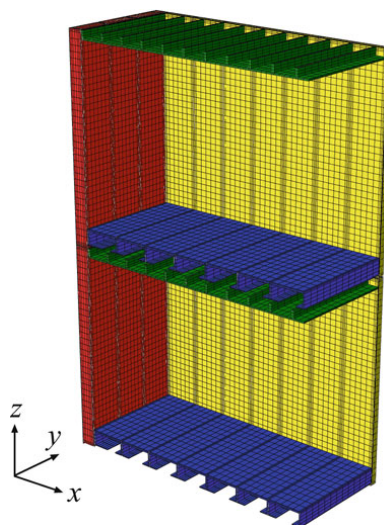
A quarter of the FE model of two stacked TVEs. The apartment separating walls are shown in yellow, the facade walls in red, the ceiling in green, the floor in blue and the elastomer blocks in grey
